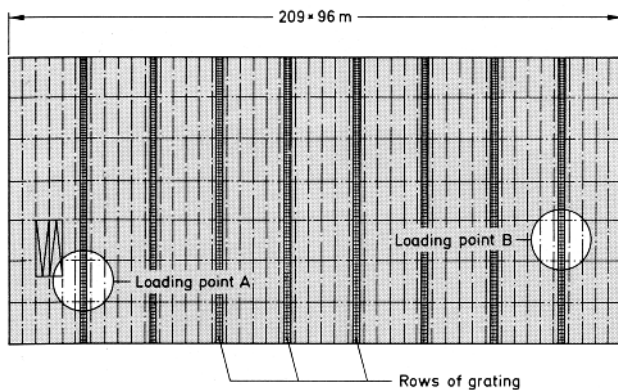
Ground plan of a car park storage area with gratings in Bremerhaven
